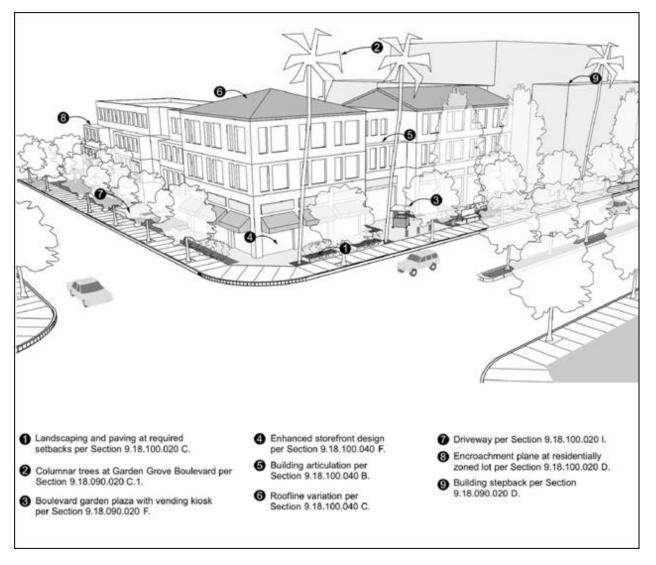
Garden Grove Boulevard Mixed Use Zones Rendering
